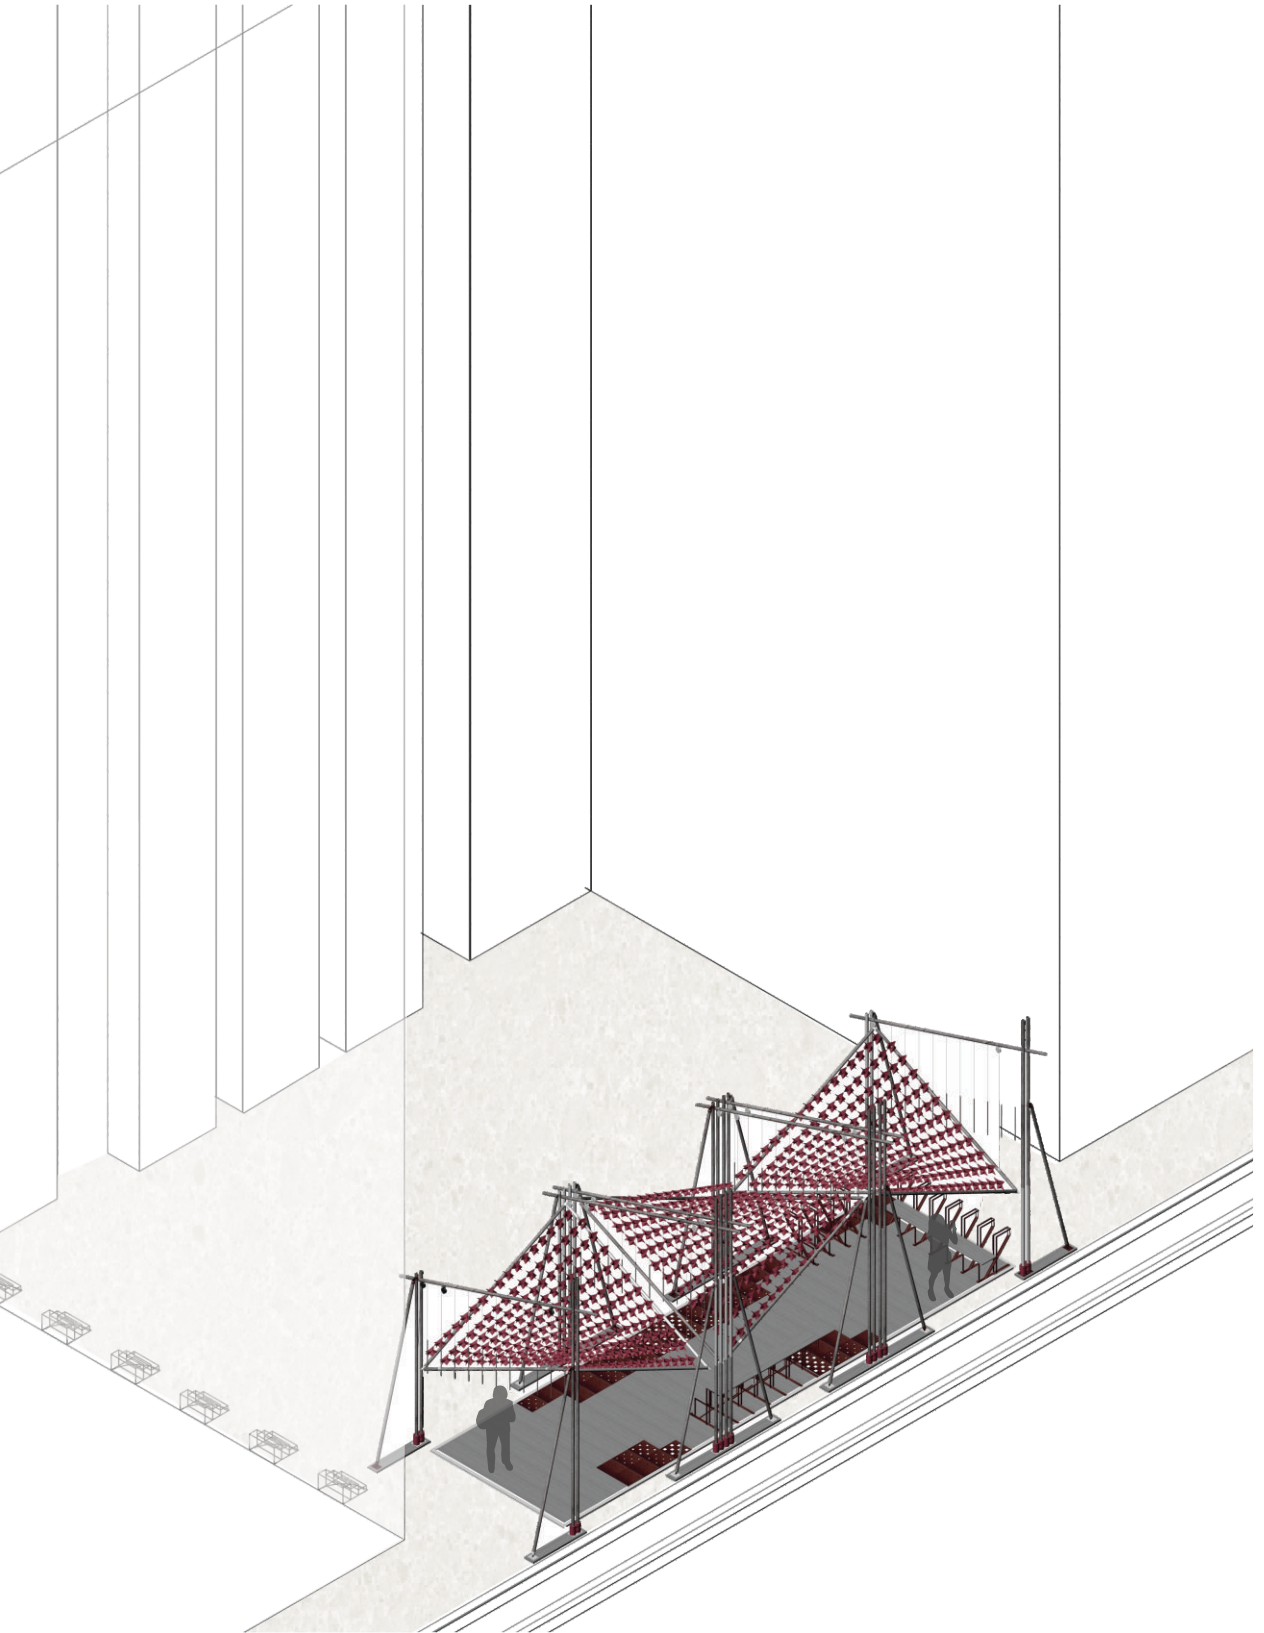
Pavilion on the Prinschurch roof (Author 2016)
